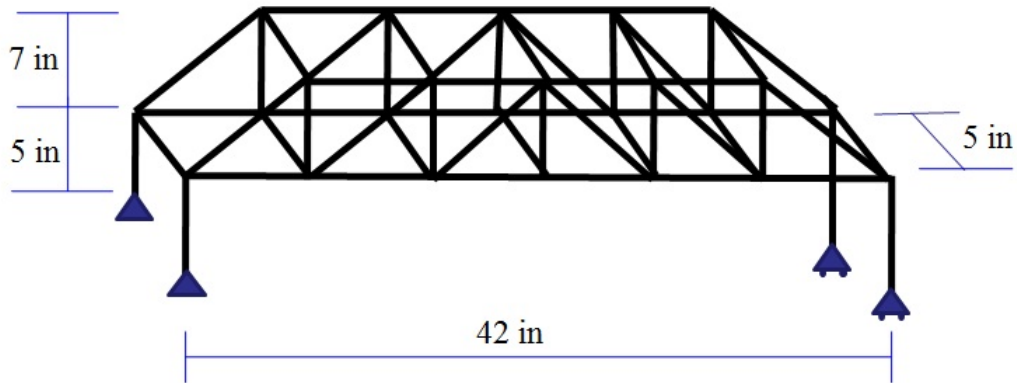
Schematic of unloaded intact numerical truss bridge model
